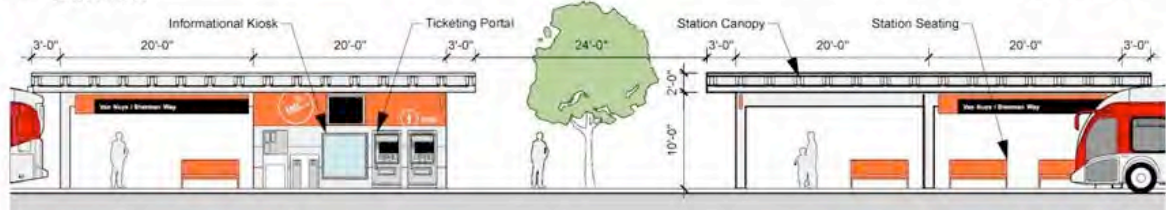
Illustrative Design Details for Curb-Running BRT Alternative
